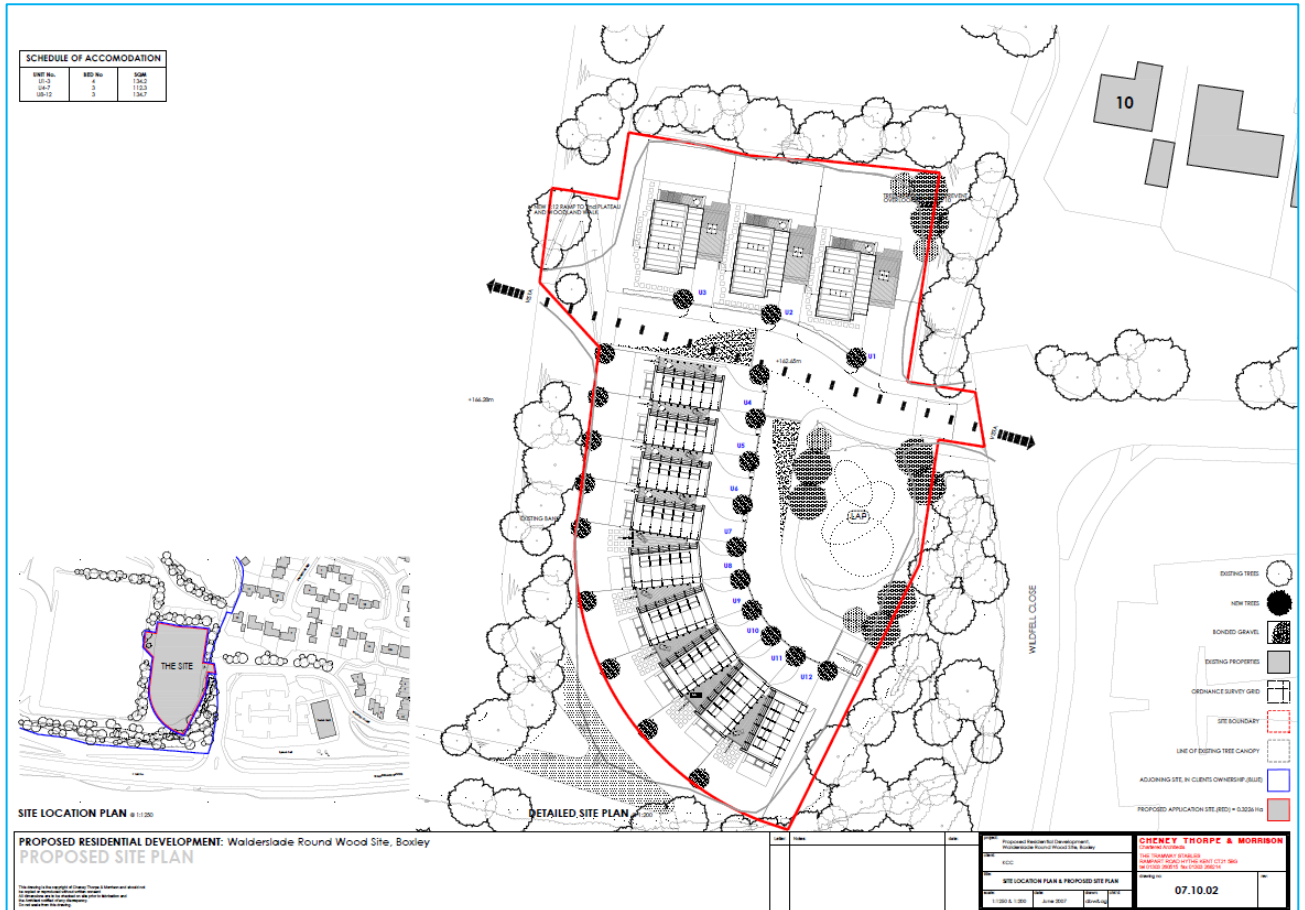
Preliminary development proposals (Drawing 'Cheny Thorpe & Morrison Site Location Plan & Proposed Site Plan 07.10.02' dated June 2007).
